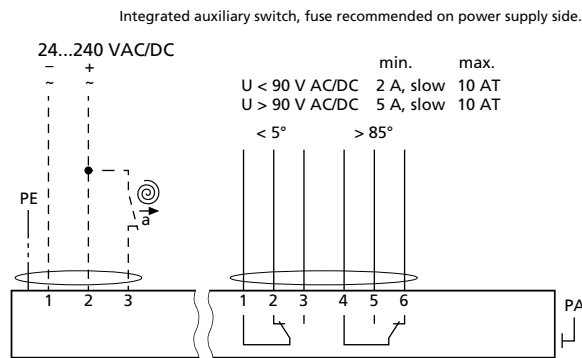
SB3.2 - Wiring of actuator acc. to SB 2.4 or SB 2.5 / cable type 6, cable diameter 7.4 mm
